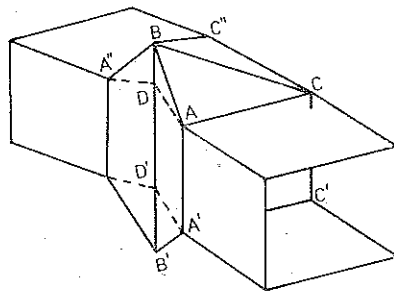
Collapse mechanism of the closed-section rectangular column.
